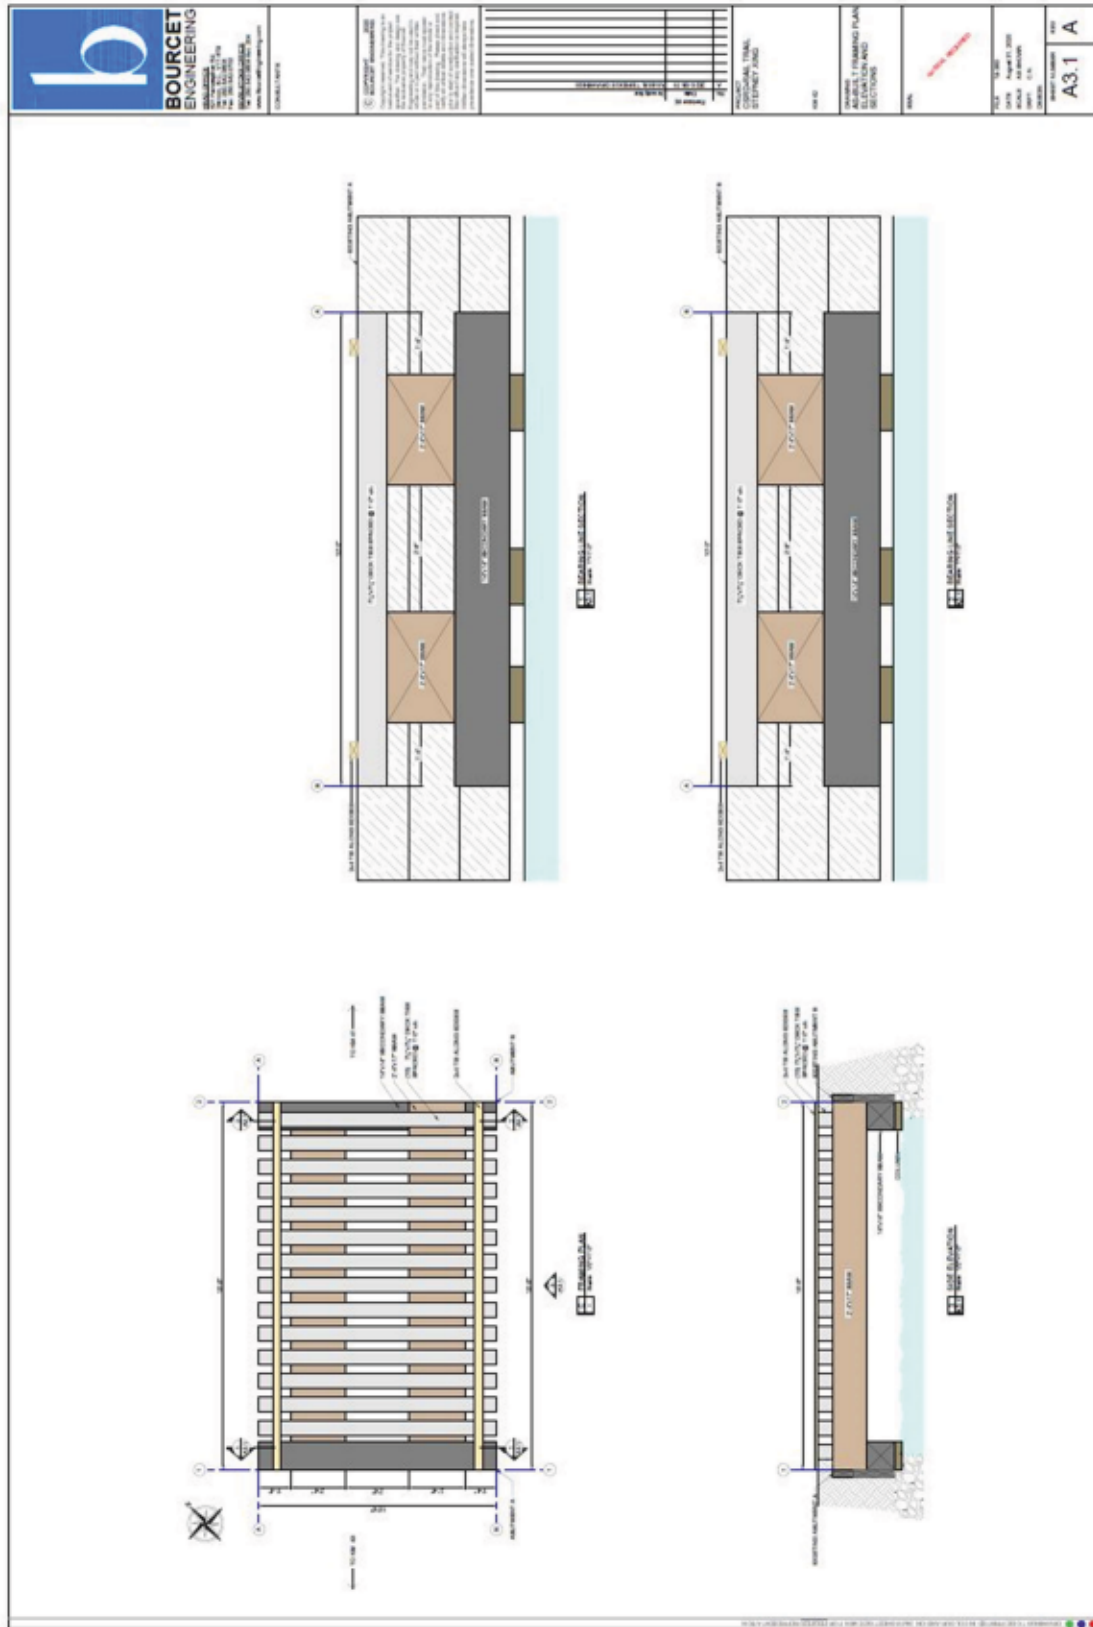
BRIDGE AT STEPNEY CROSS ROAD KM 42- EXISTING AS-BUILT INFORMATION
